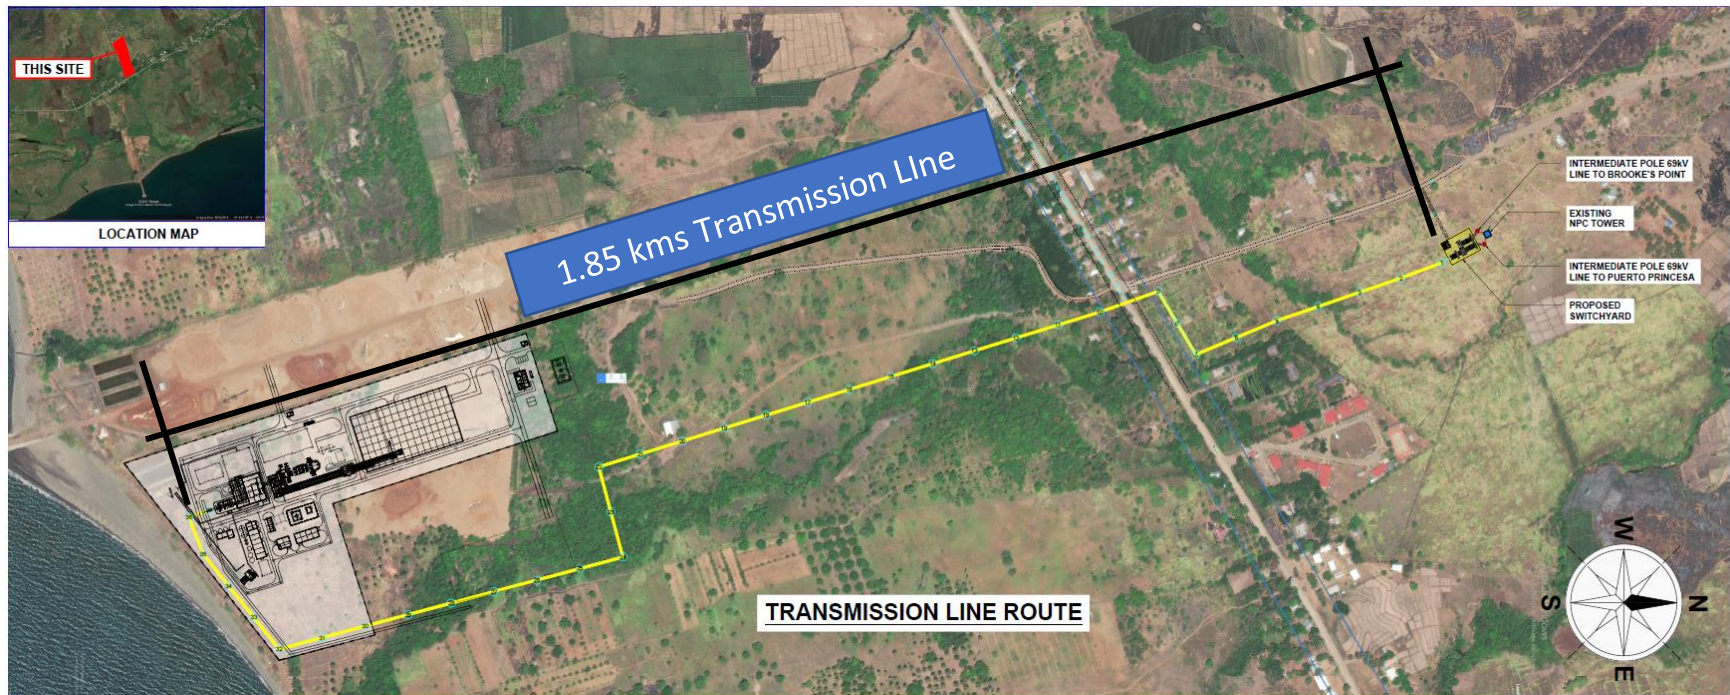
15MW DPTPP 69KV INTERCONNECTION FACILITIES SITE DEVELOPMENT PLAN
